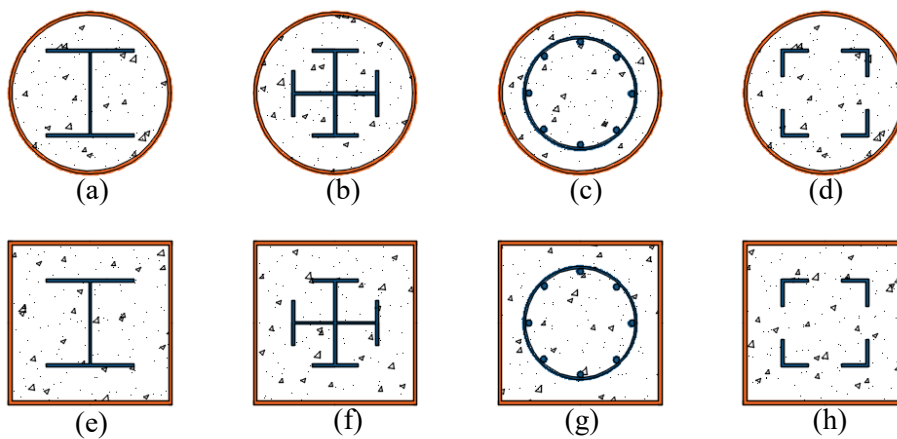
Typical cross-section types of CFSTs with internal steel stiffeners
